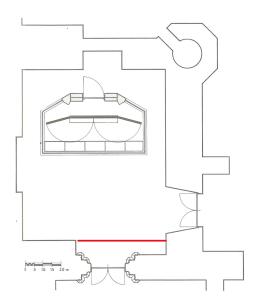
Floor plan of the Villa Chapel, position of glass wall
